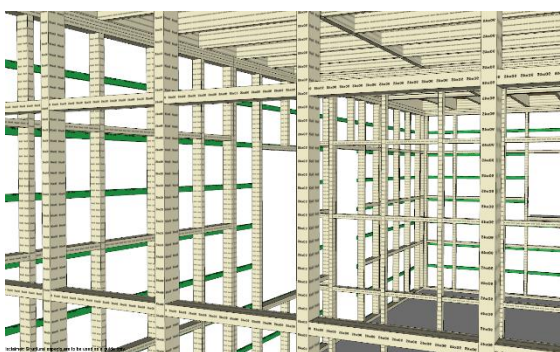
Example recent project showing extend of new framing to floors that may be required.
